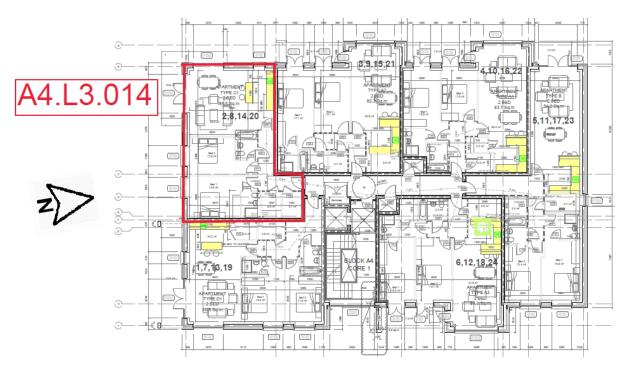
Floor Layout of the Existing Block A4 (Bridgefield)— Third Floor
